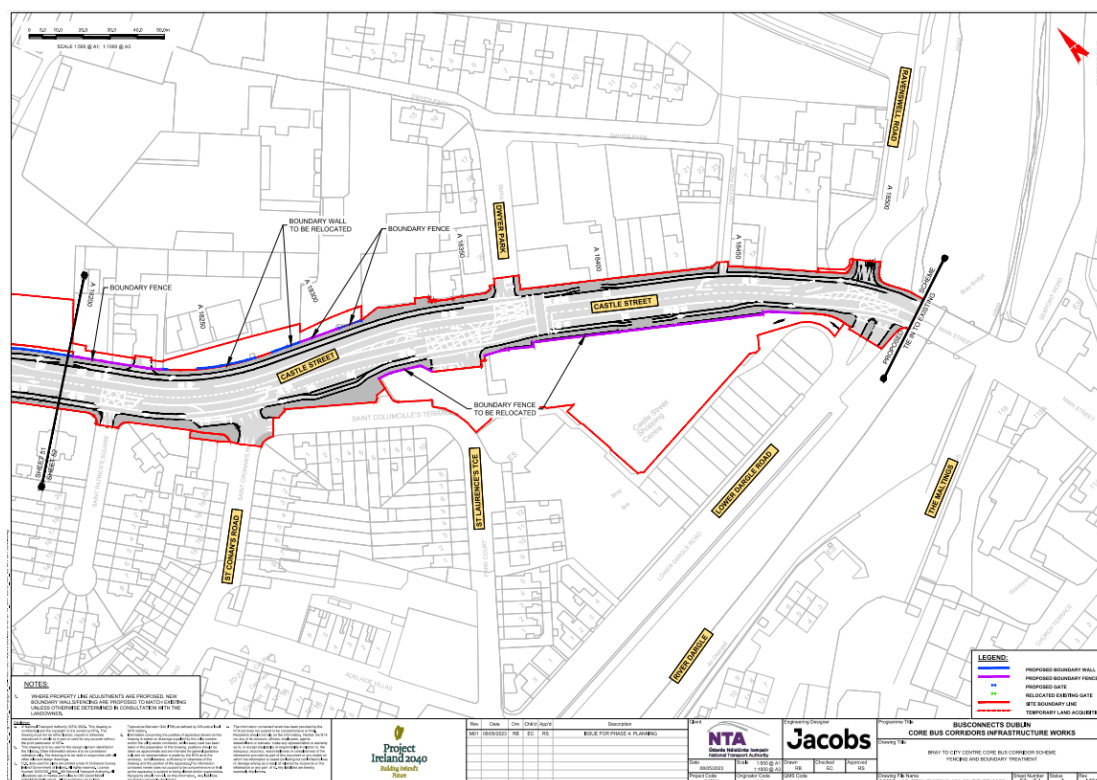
Extract from Fencing and Boundary Treatment Drawing at Castle Street (Sheet 52)
